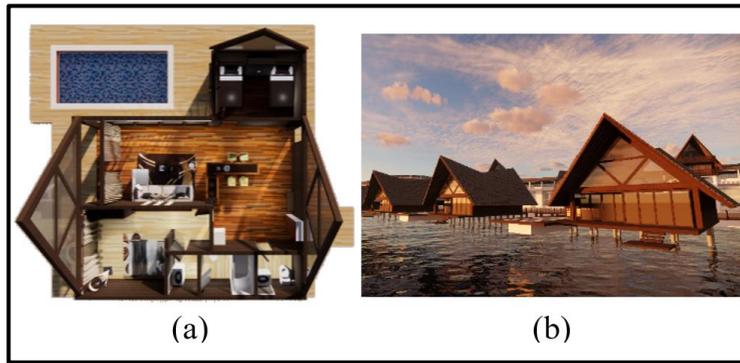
(a) Floorplan Deluxe Room; (b) Perspective of Deluxe Room
